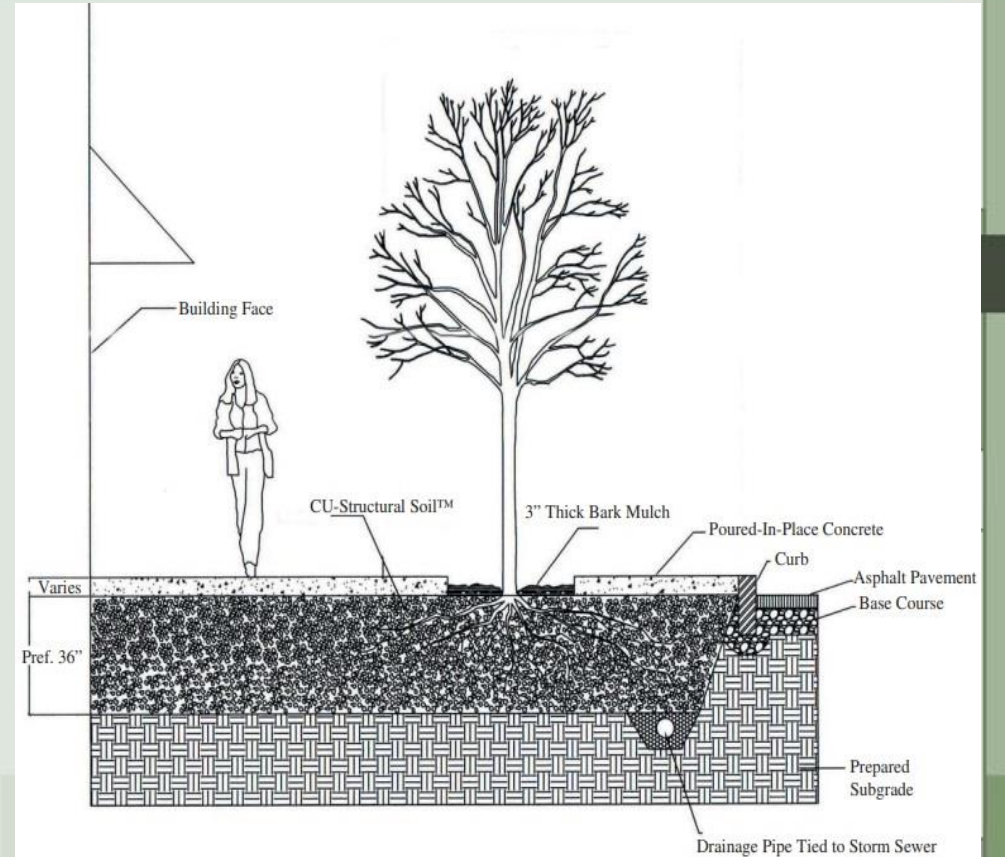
Typical street tree planting using CU-Structural Soil™ under a sidewalk
